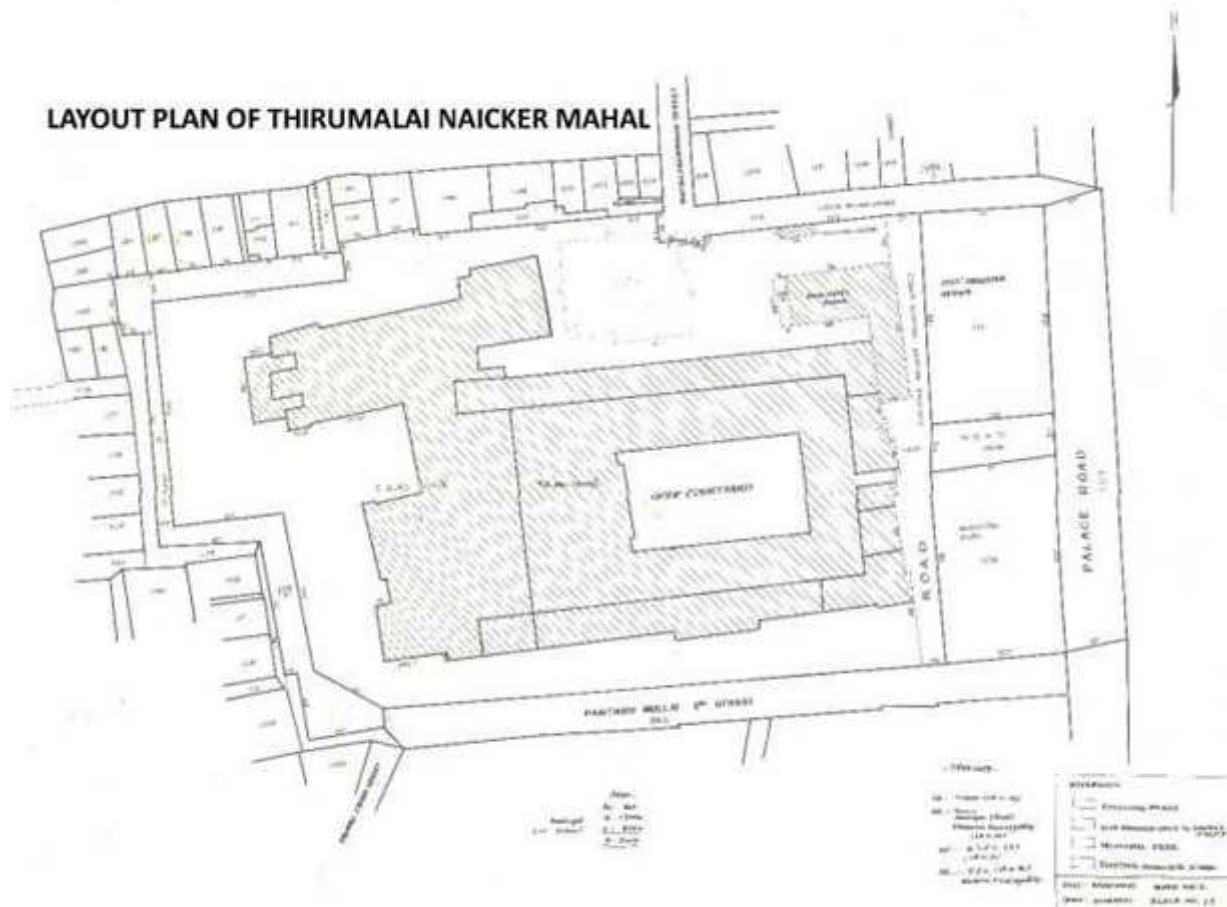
(c) Proposed site plan for subproject components – Thirumalai Naicker Mahal at Madurai District
